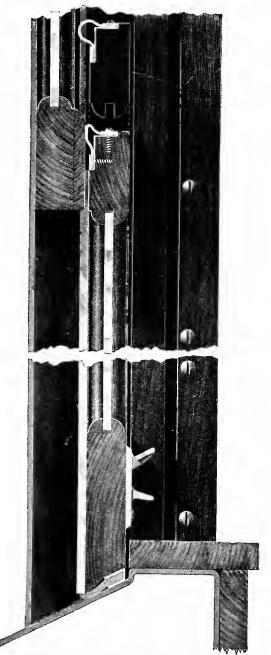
Section Through Windows Equipped with Universal No. 70 Extension Sash Lock.
